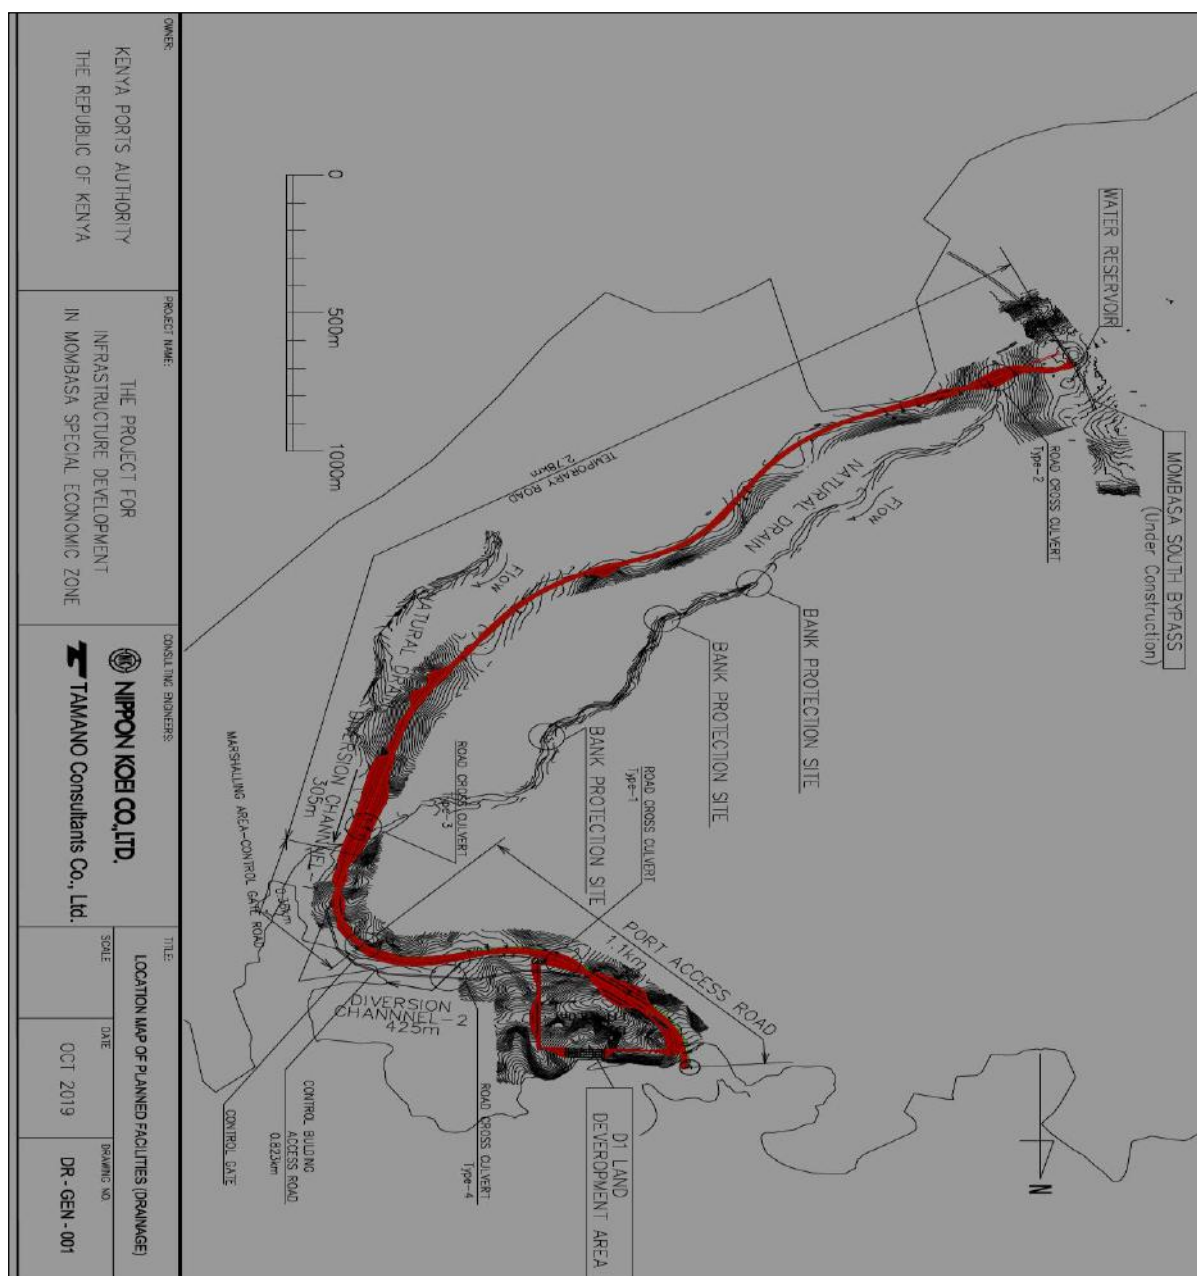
Schematic layout of the Port Access Road and the proposed drainage improvement points
